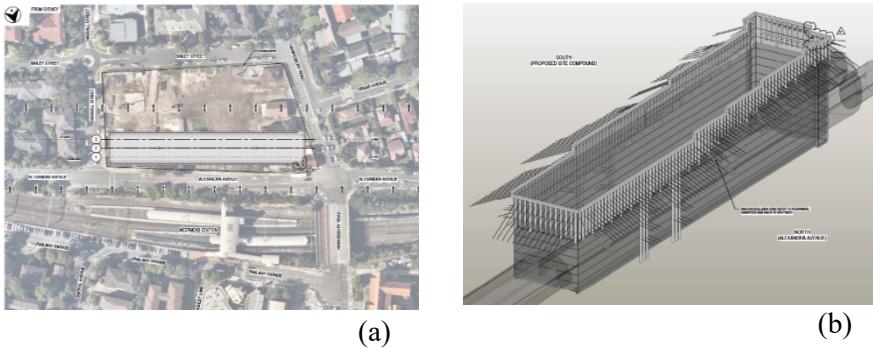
Westmead metro station: (a) layout plan, (b) 3-d illustration
